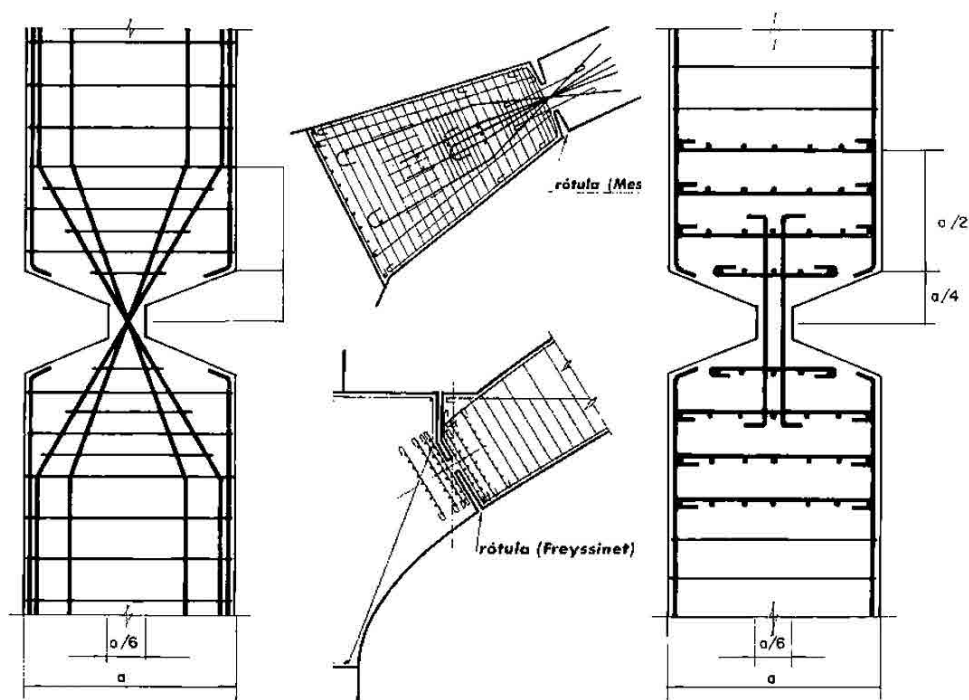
Pillar and beams connection. From F. Casinello, *Hormigonería*, Reverte, 1996, Madrid.
